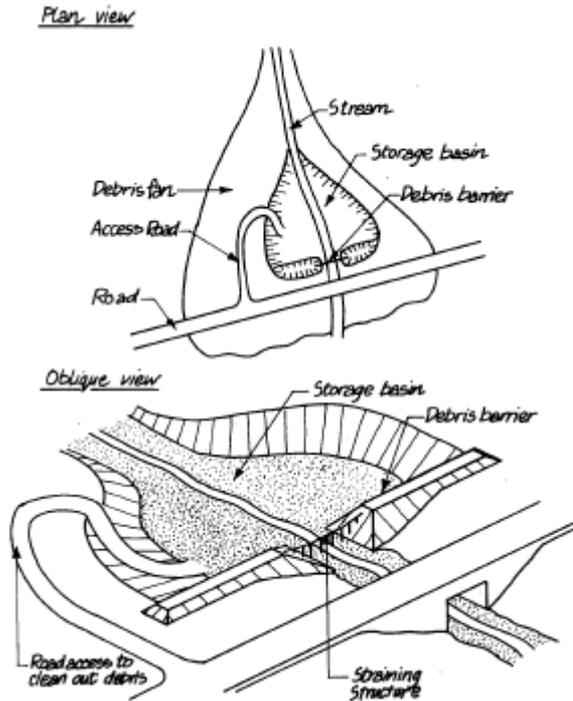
Plan and oblique view of typical components of a debris barrier and storage basin
